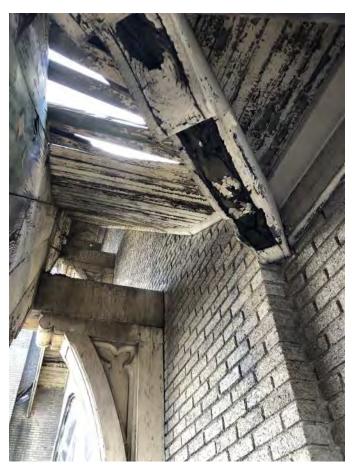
UNDERSIDE OF EAVES ON THE EAST ELEVATION AT THE MAIN ENTRANCE; WOOD DECKING IS DETERIORATION AT THE EAVE; MISSING WOOD DECKING; WEATHERED AND DECAYING SUPPORT BRACKETS
